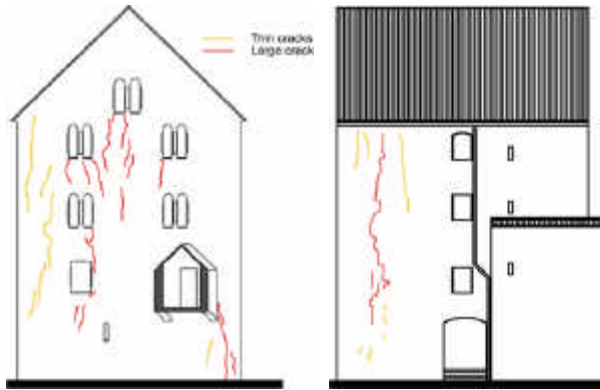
Pisece Castle. Crack pattern survey of the Tower in the South and East side
